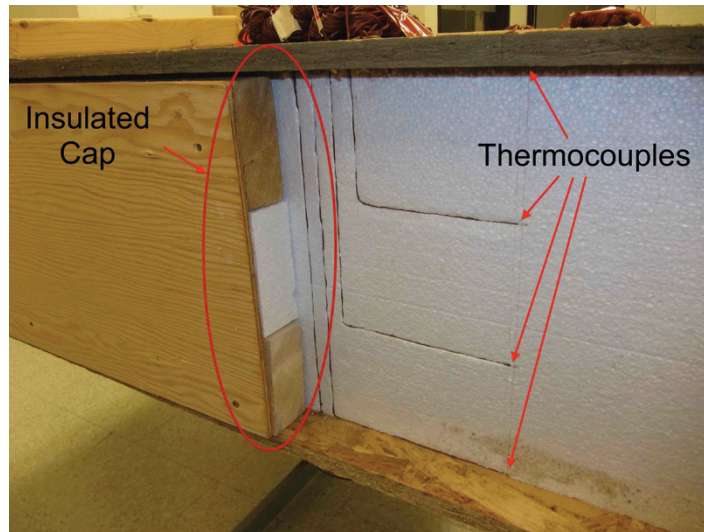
Insulated caps are used to fill most SIP joints. An example of installed thermocouples is also shown
